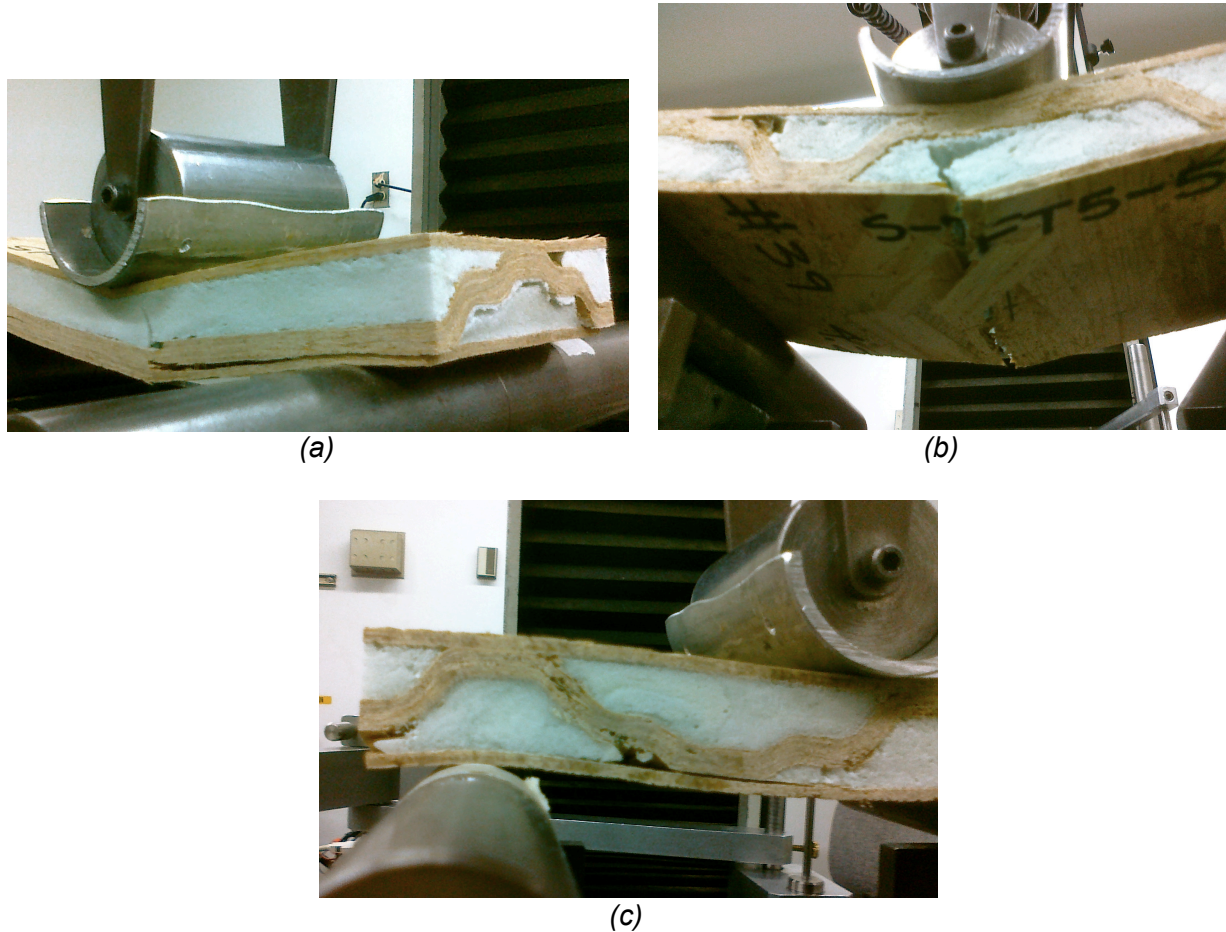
(a) Delamination and flexure failure in longitudinal core shear specimen, (b) Bottom ply tension failure in transverse core shear specimen, and (c) delamination failure in transverse core shear specimen.
